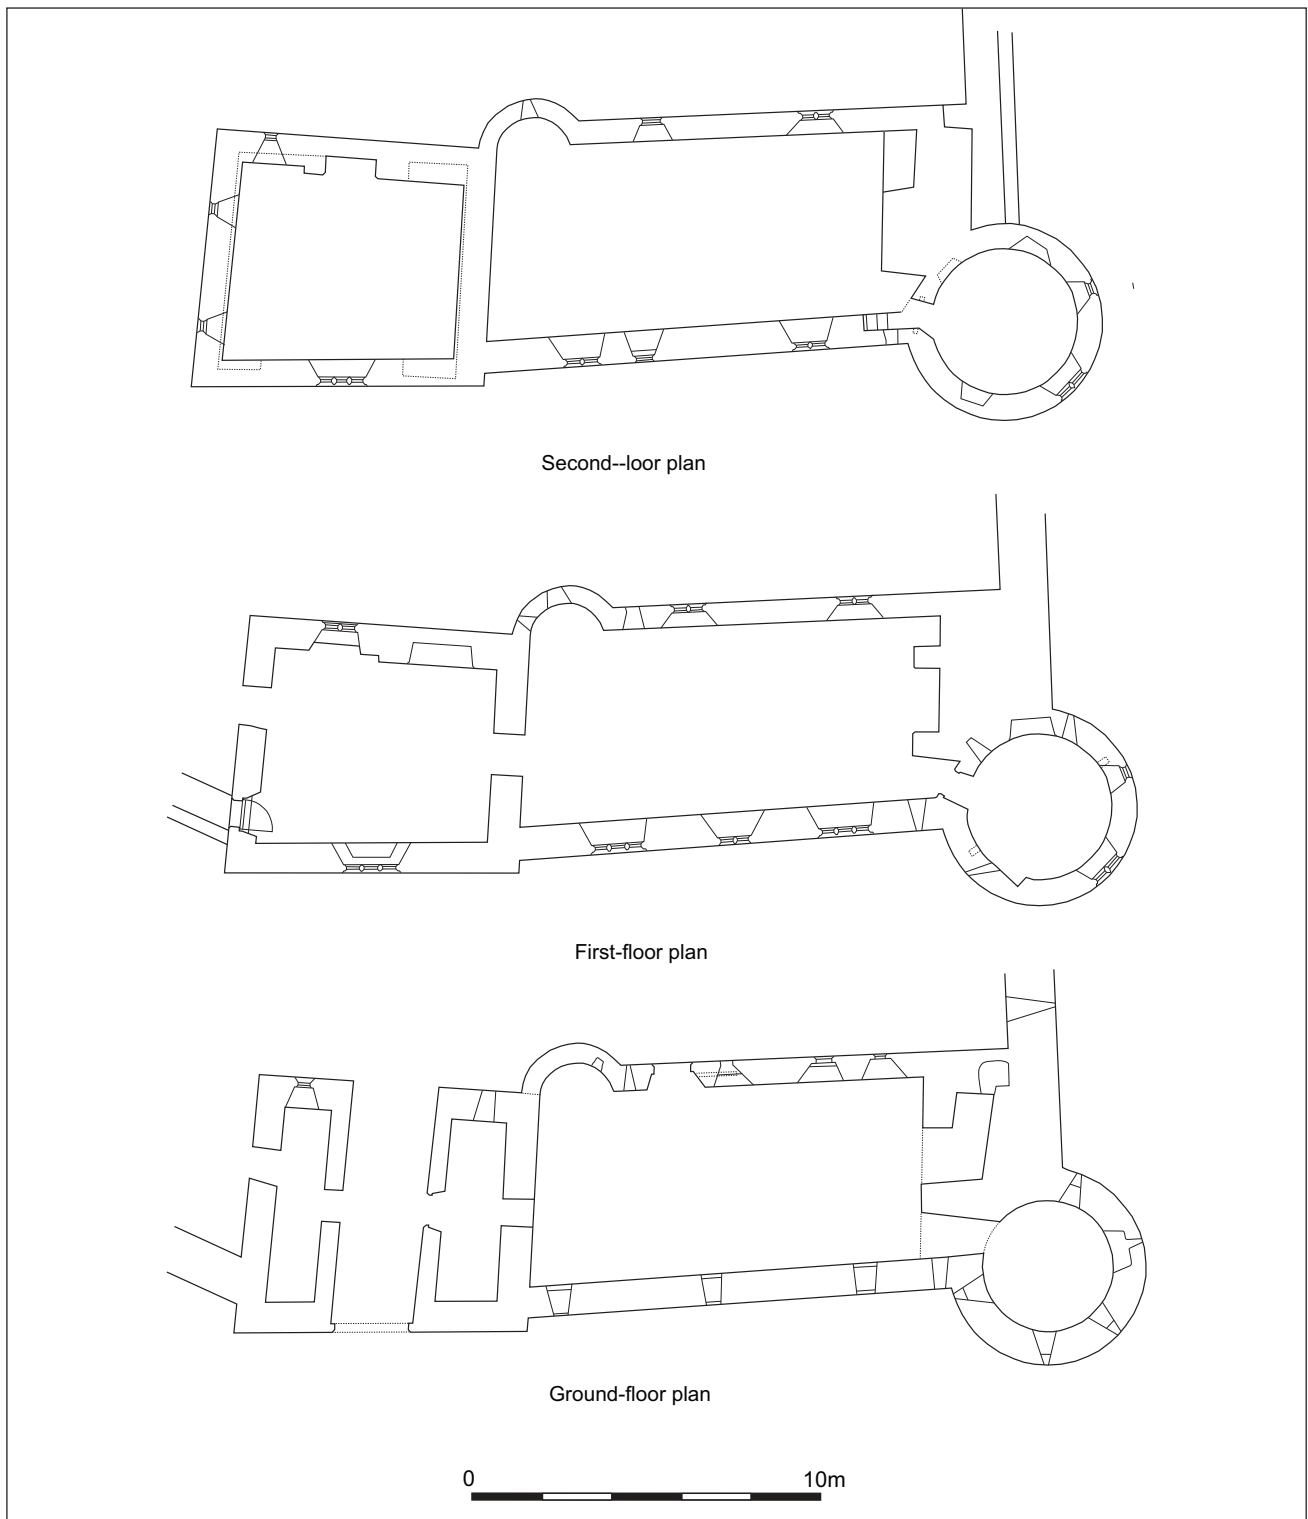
Floor plans of the gatehouse, manor house and north-east corner tower (Office of Public Works).
